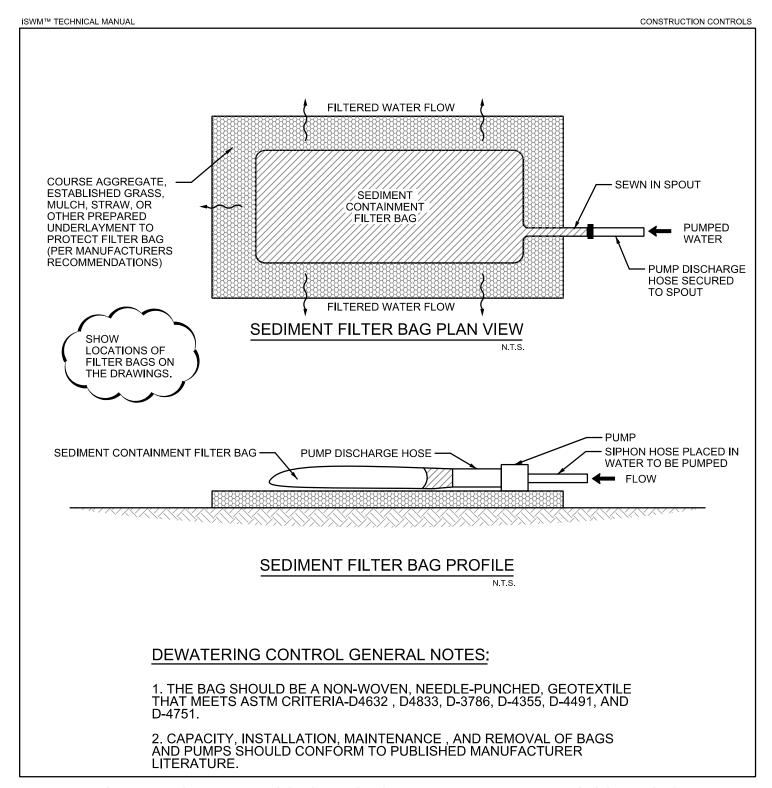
STANDARD CONSTRUCTION DETAIL - DEWATERING CONTROLS
